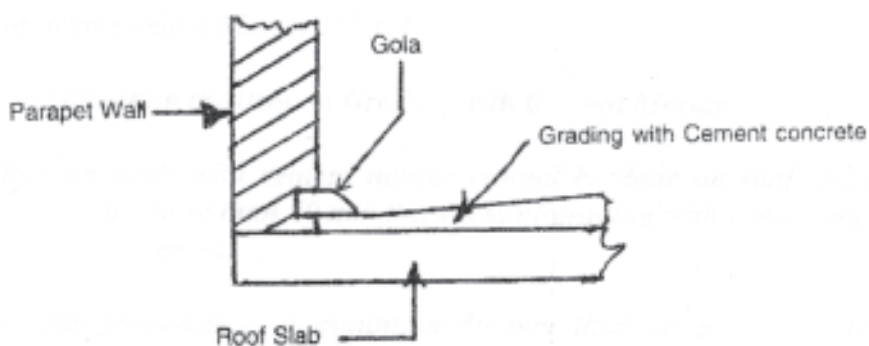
Position of Gola in the Work of Grading Roof Slabs
